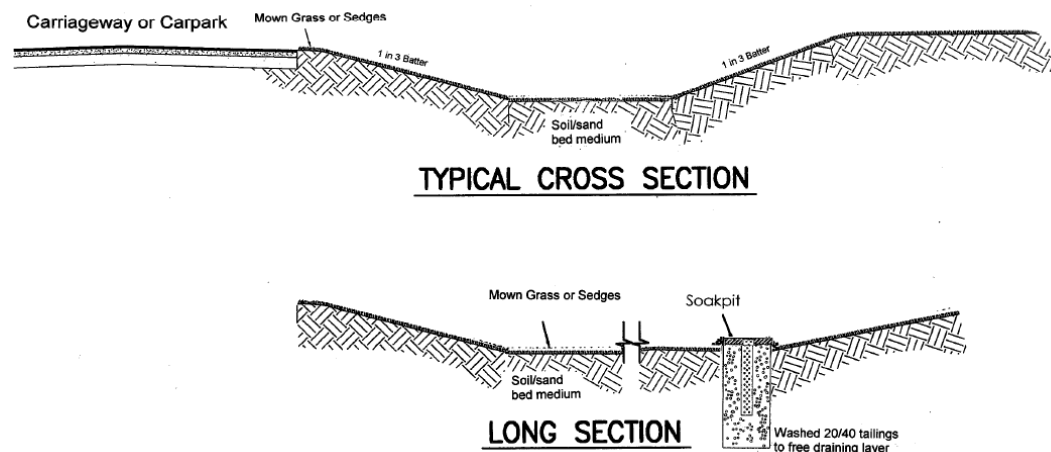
(b) – Typical Swale and Soakpit Cross Sections
